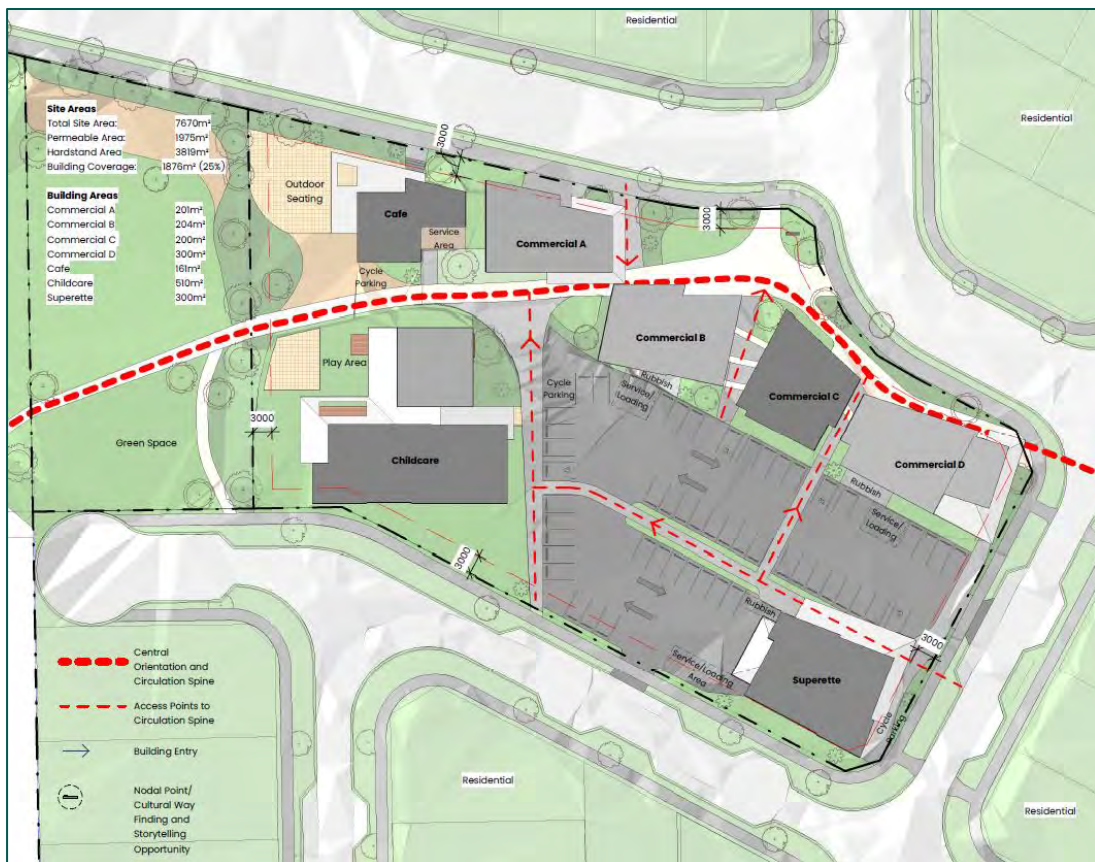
Commercial Node proposed bulk site plan (Source: AWA Architects)
